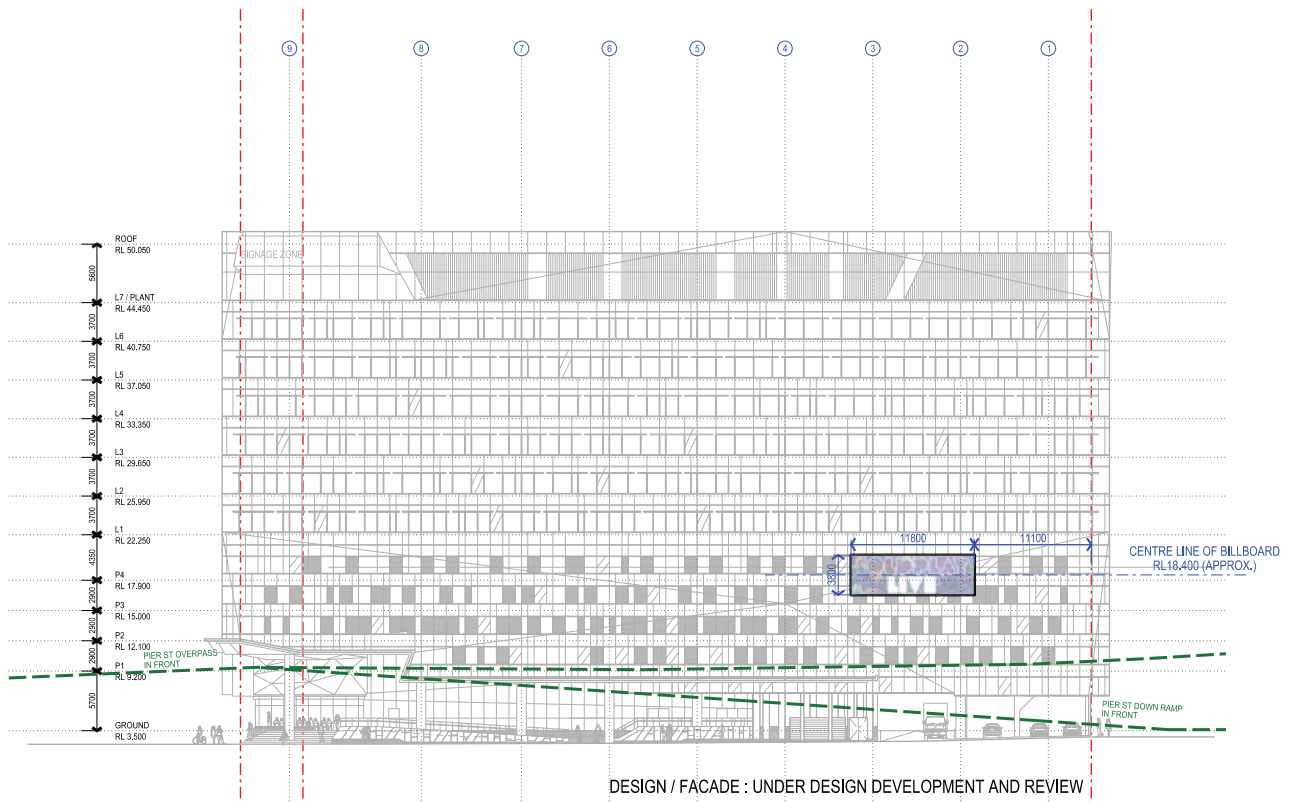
Elevation - Northern Elevation of proposed North West Plot Building, Lend Lease
